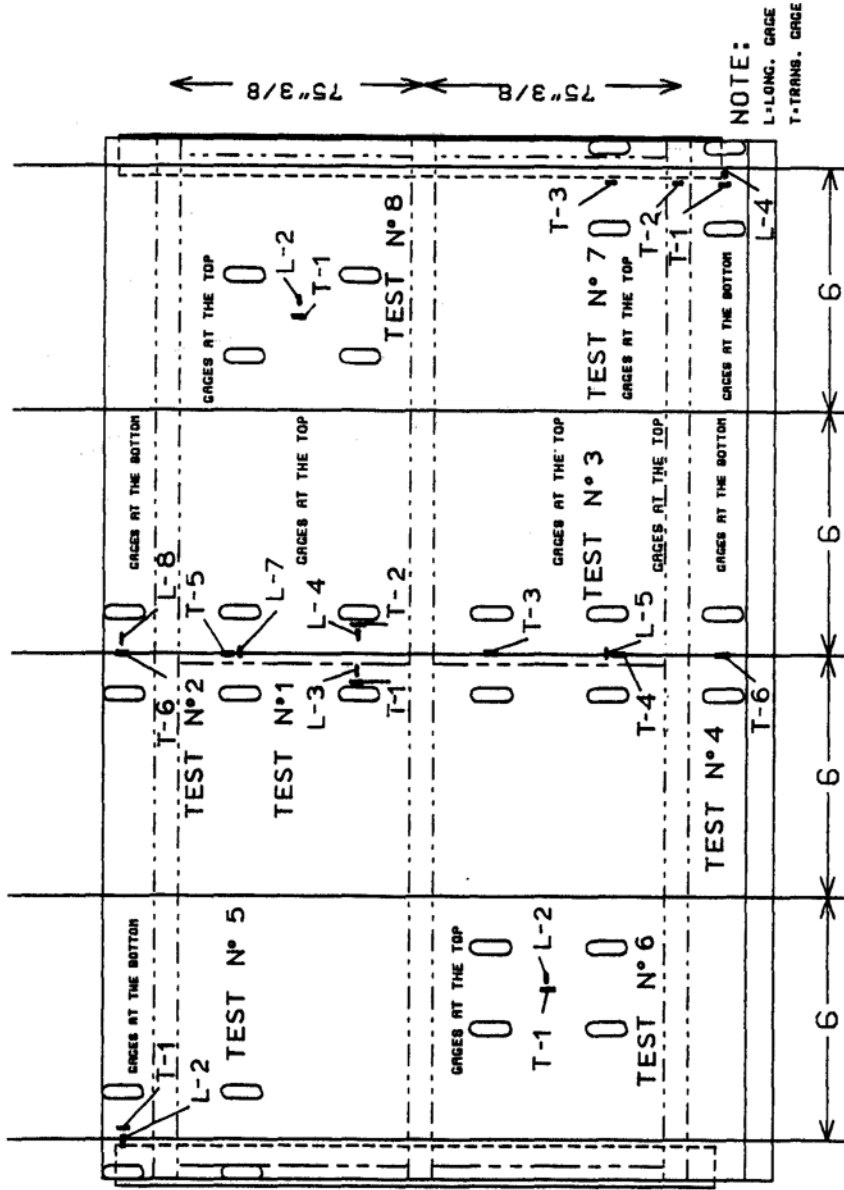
Concrete Strain Gage Locations (Second Bridge)
